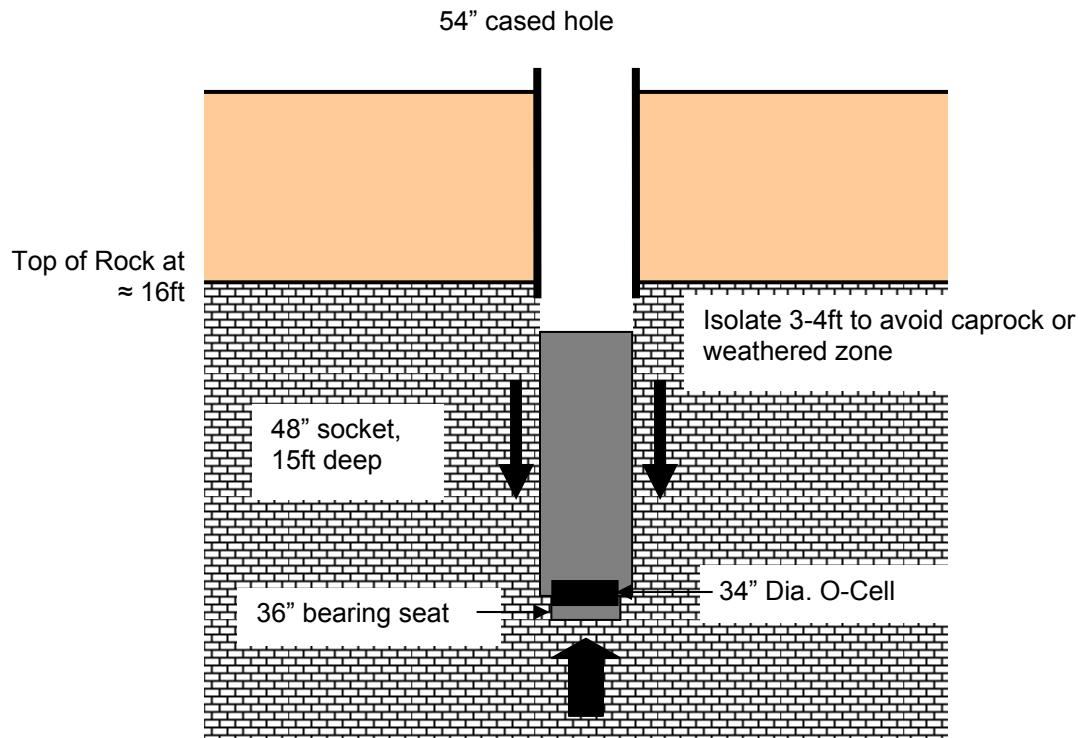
Schematic of Proposed Test No. 1, Nashville Site
